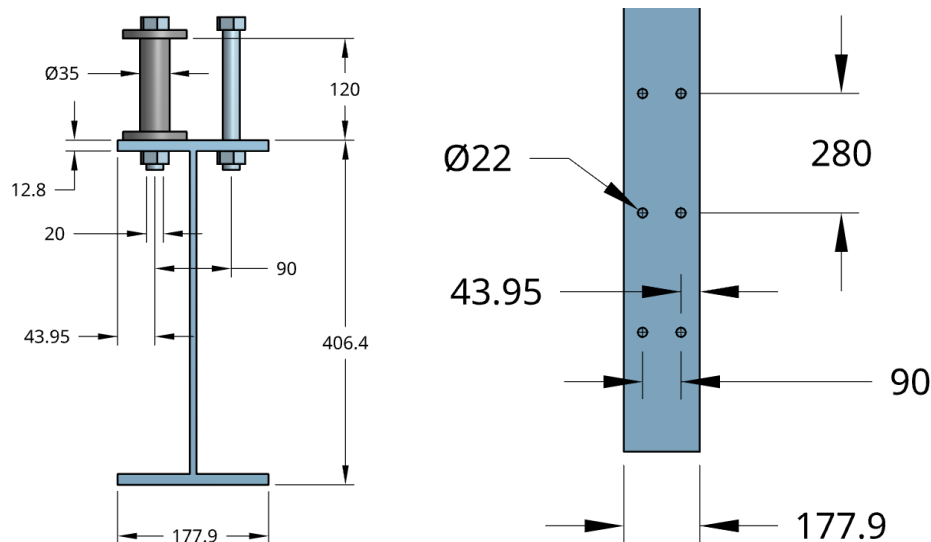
Front view of the shear connector and the steel beam left drawing. Top view steel beam right drawing.
